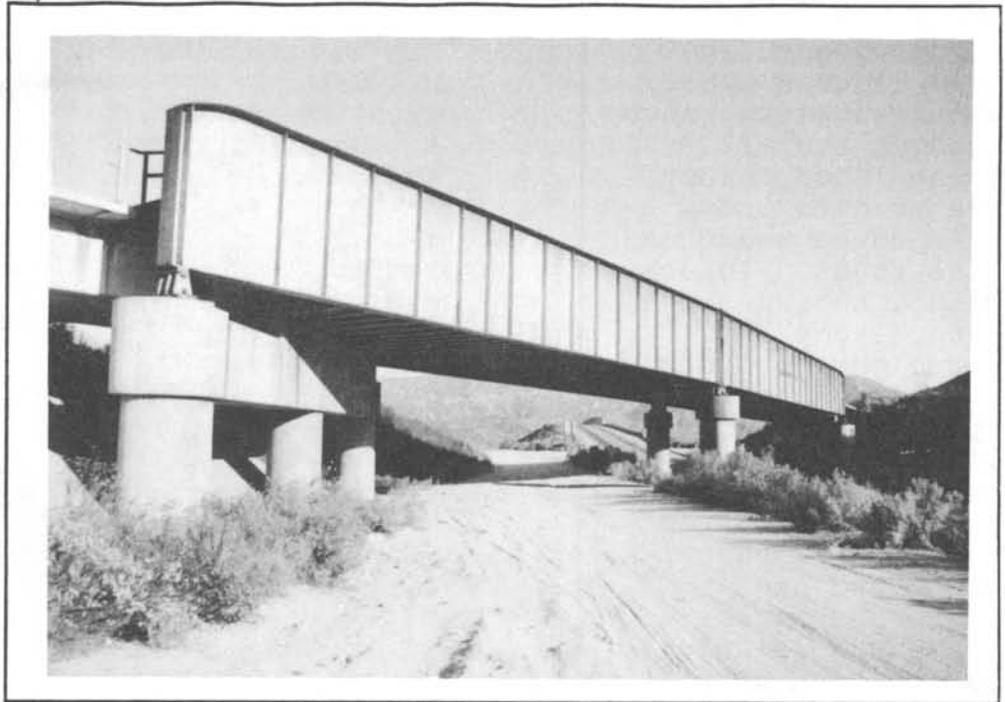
Ballasted Deck Railroad Bridge Over Highway 138
